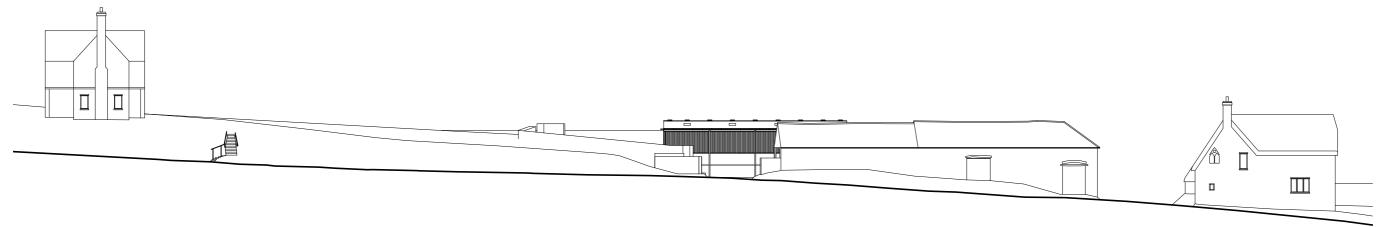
Pound Lane/Colony Road - proposed and existing elevations
